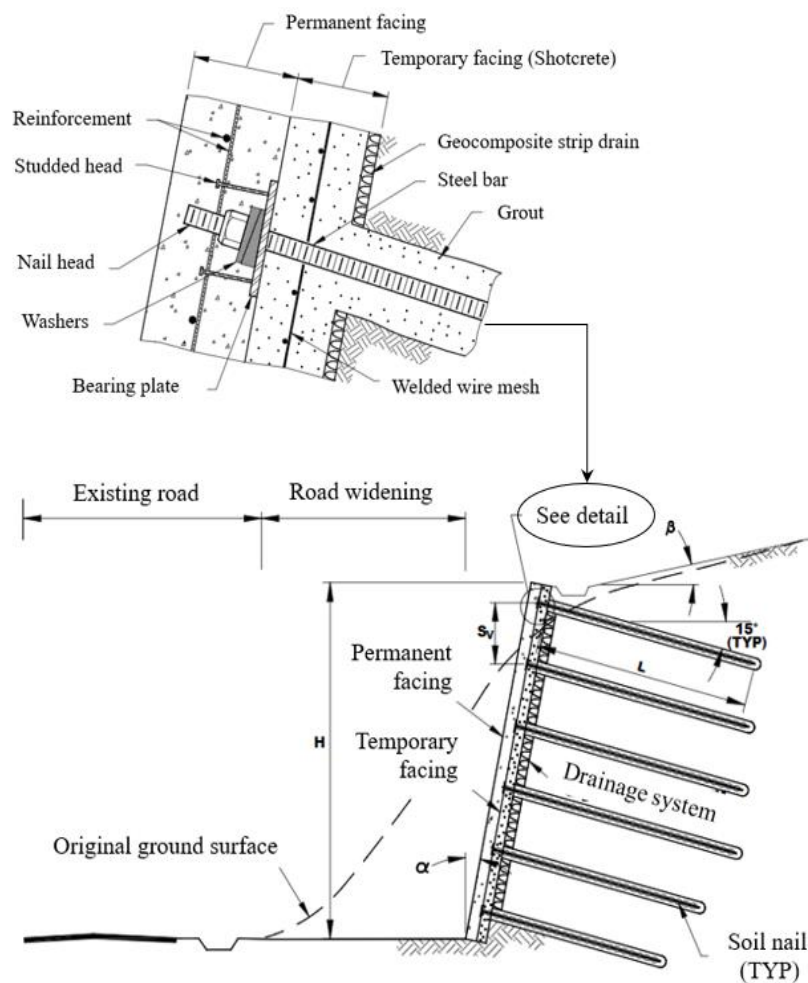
Typical cross-section of soil nailed wall (Lazarte et al. 2003)
